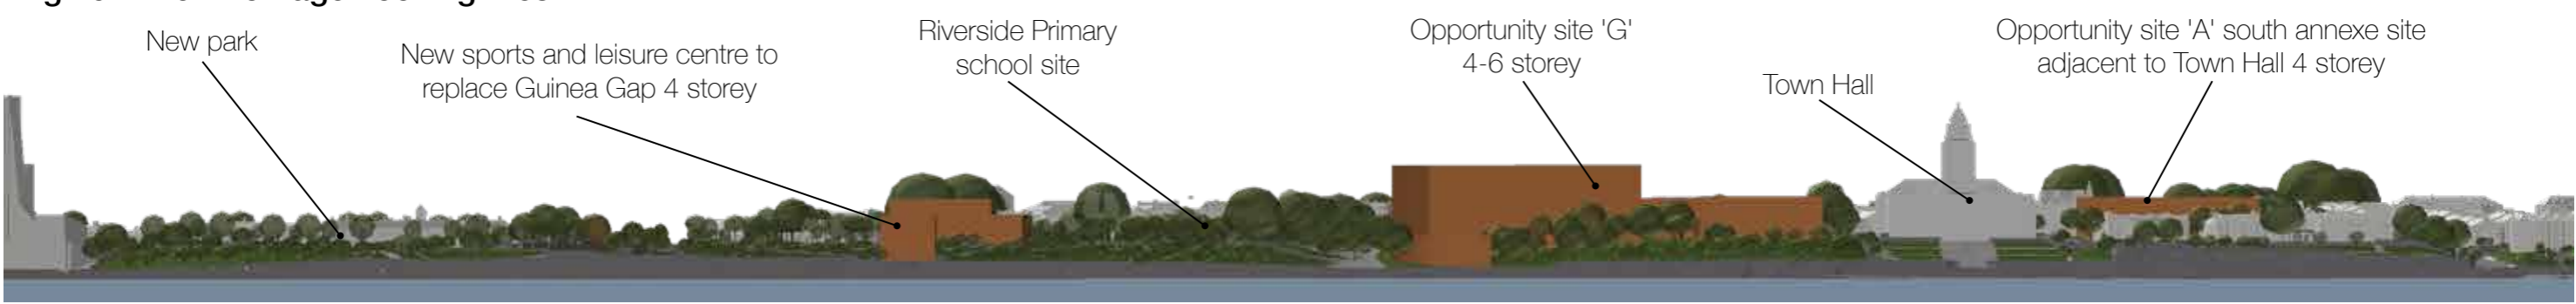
Conceptual Modelling Town Hall Quarter Masterplan
